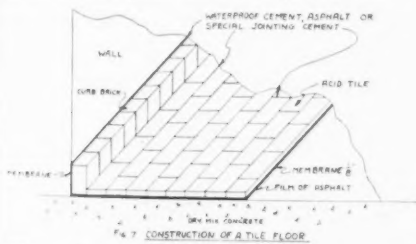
CONSTRUCTION OF A TILE FLOOR
